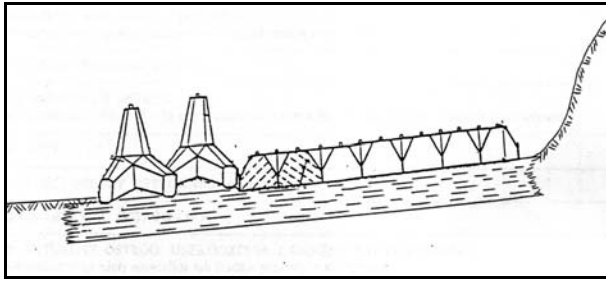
Typical cross section of the seawall made of concrete tetrapods and pyramids lying on sticks
